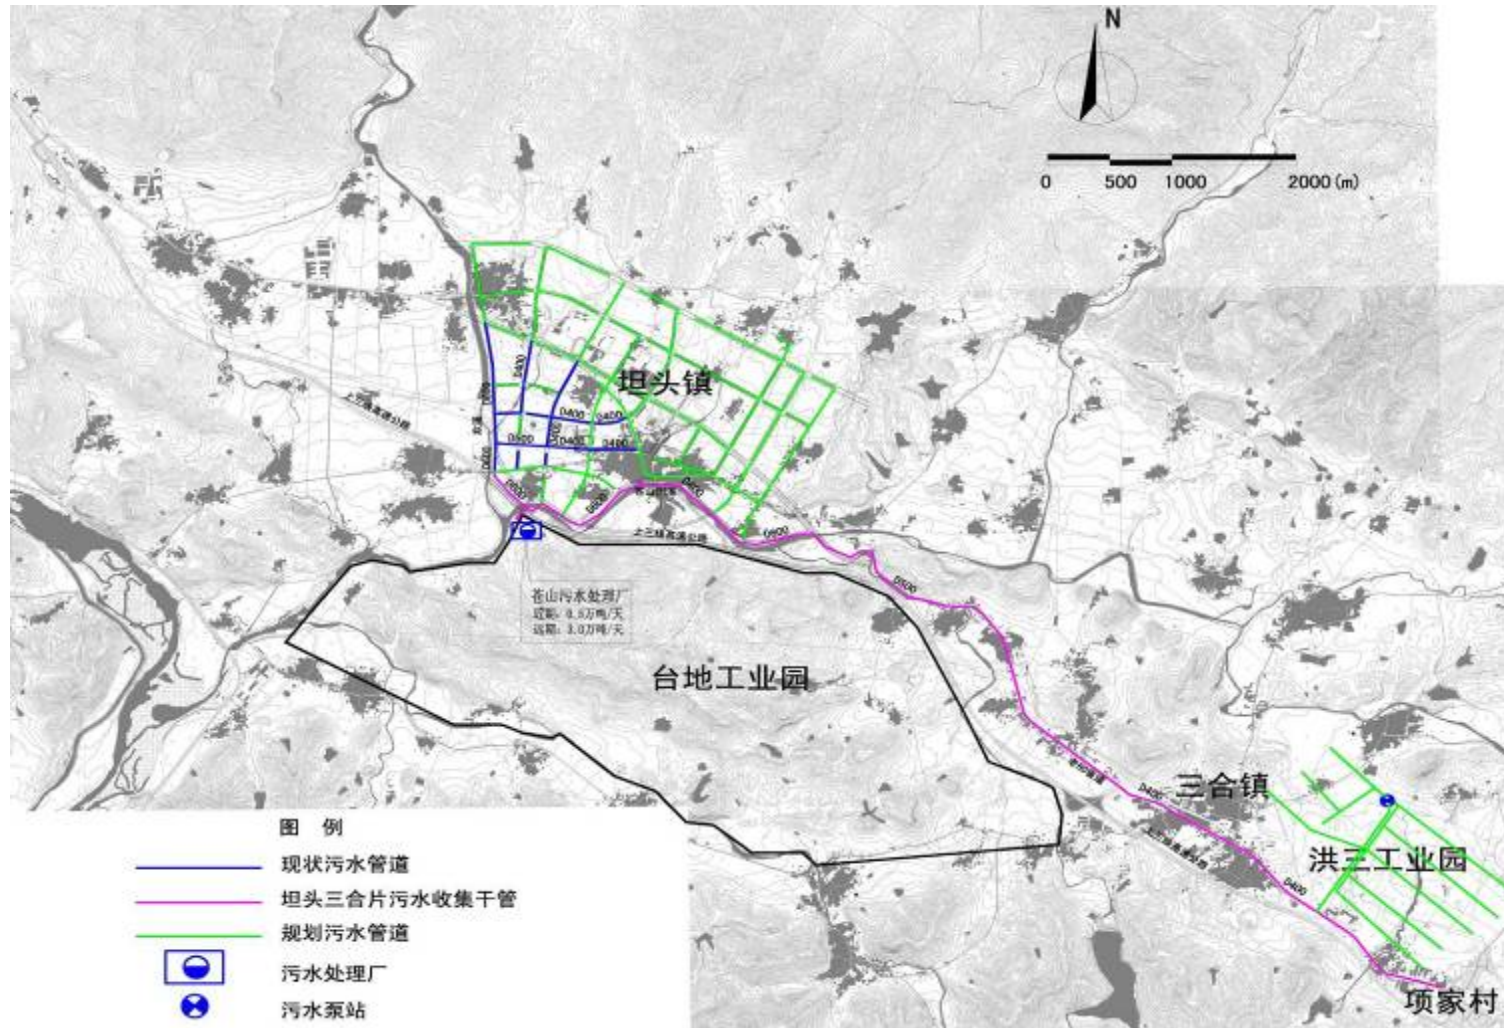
Layout Drawing of Tantou Sanhepian Sewage Collection System of Tiantai County
